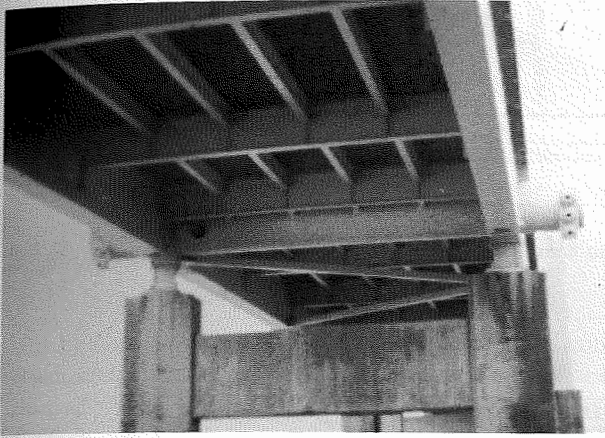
Sitka Harbor Bridge, cross section of bridge deck and supporting piers. (Courtesy of Civil Engineering ASCE, from reference 1.)
